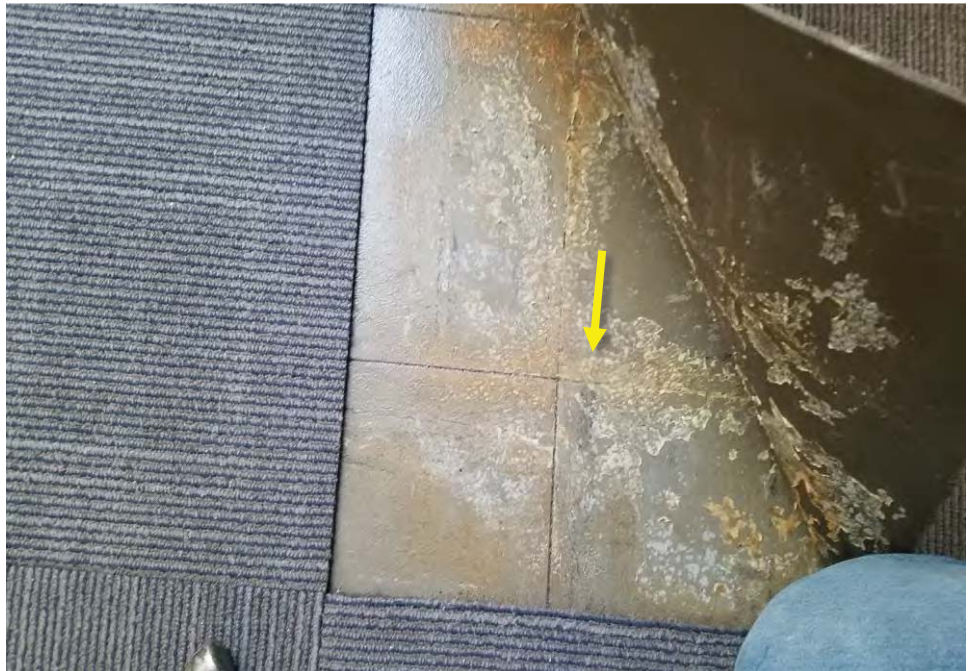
Multipurpose Building: View of asbestos-containing 9"x9" grayish vinyl floor tile and mastic under vinyl floor sheeting in hallways and break room.
